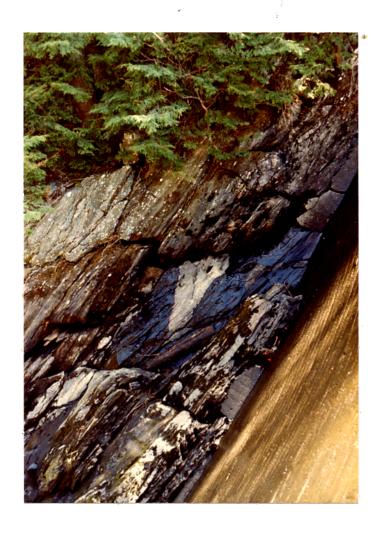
Seepage through joints in rock forming right abutment, downstream of spillway.
